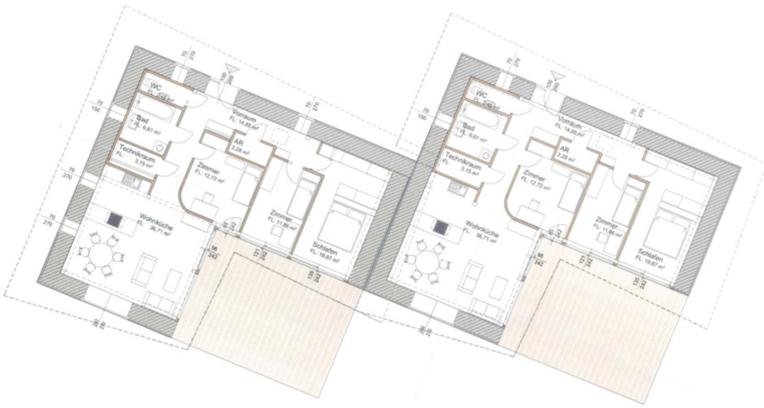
Floor plan of the atrium-style buildings based on the planning design (Arch. Scheicher)
